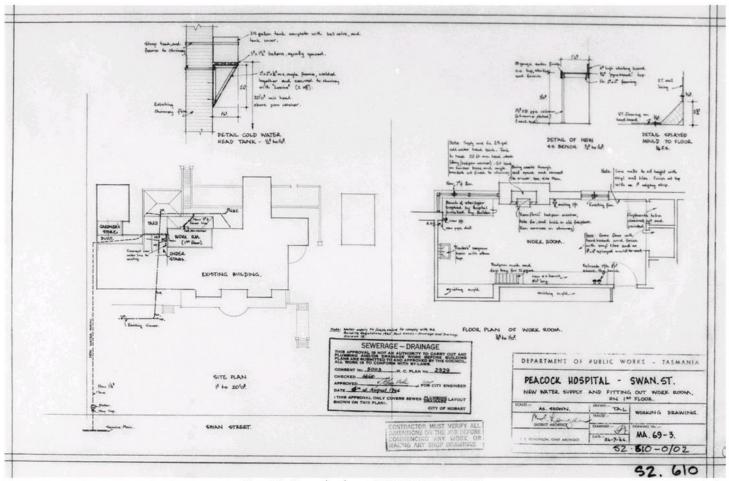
Proposed work room 1966. TAHO PWD266.4.43715.
